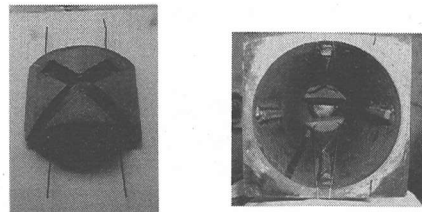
Strain measurement at surface on filled concrete in case of CH40 and CH40-BS specimen
